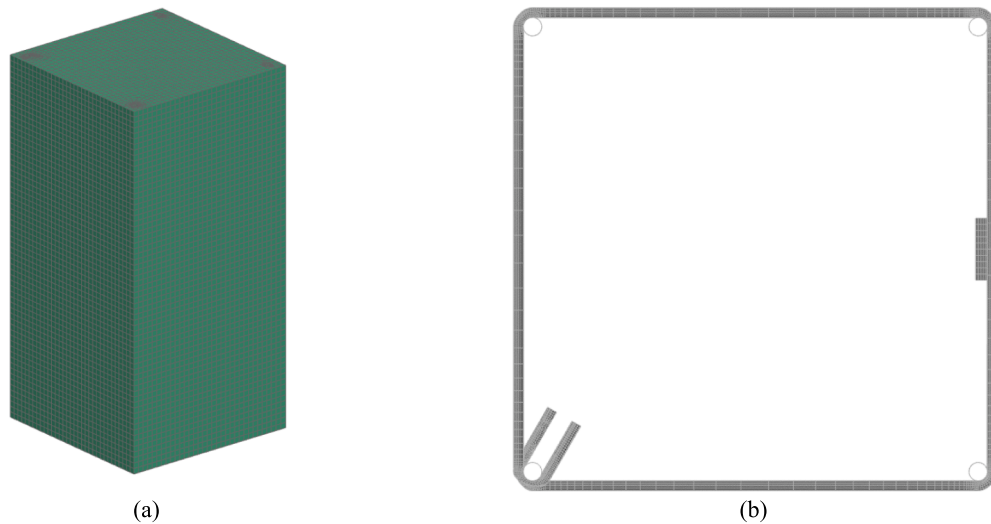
Boundary element discretization: a) Concrete column, b) Rebar and anodes.
